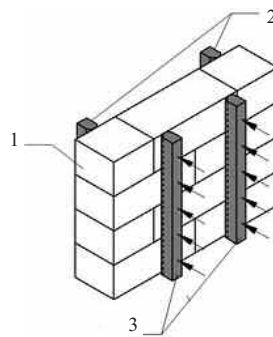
Scheme of tensile test in bending in the plane of bed joints
